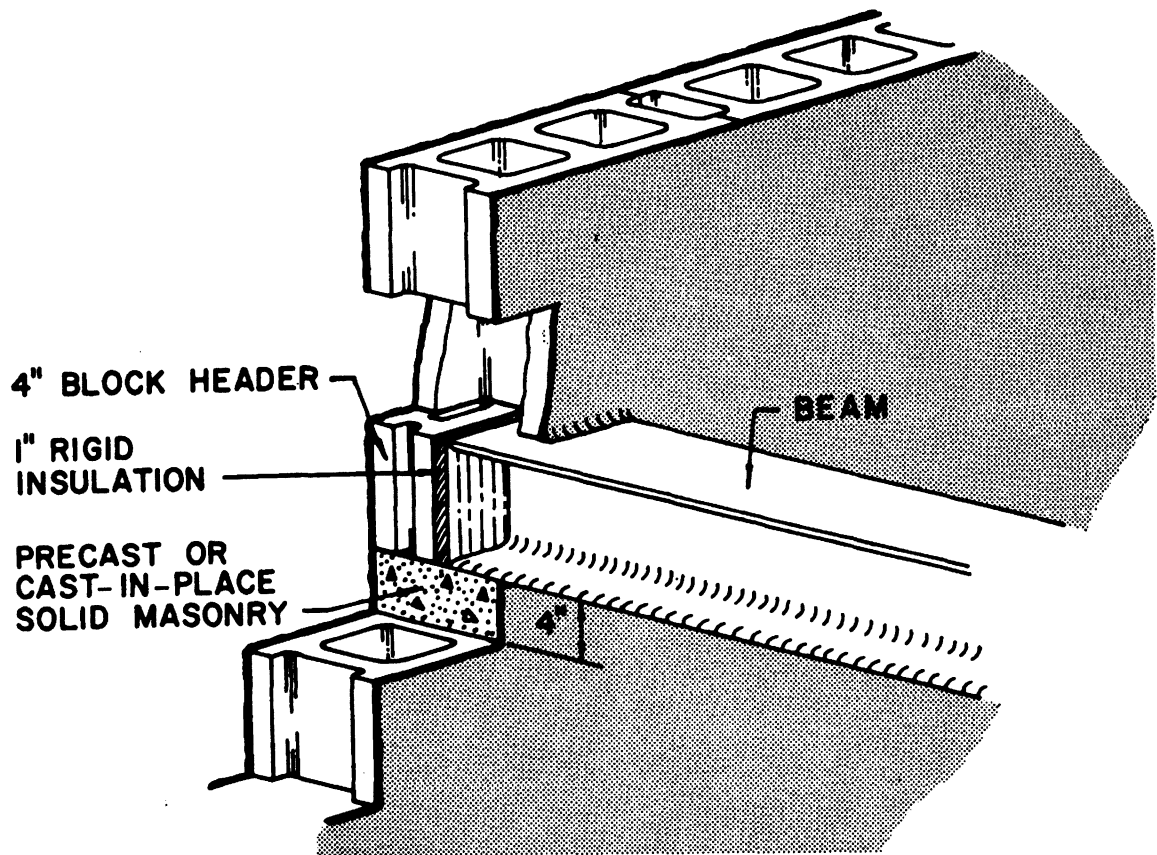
Supporting joist, or beam, in a surface-bonded wall. Reinforce block cores beneath beam with steel rods and concrete as required by building code.
